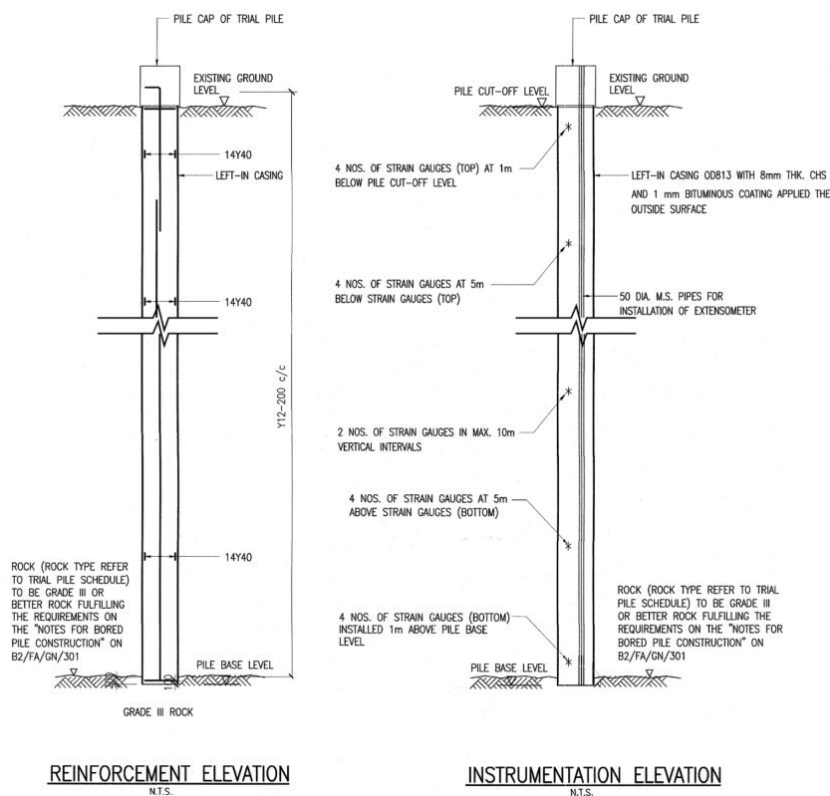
Typical Detail of 813 mm Diameter Test Pile at Sai Sha
